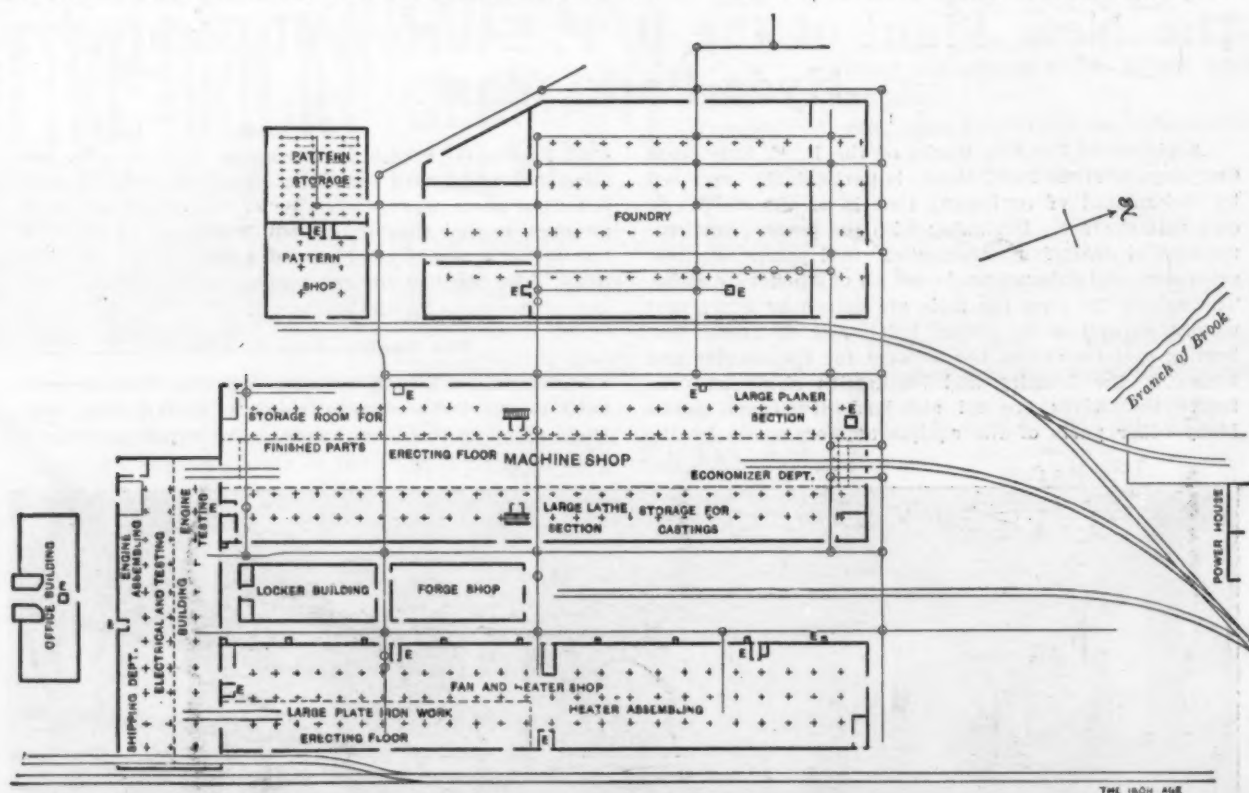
Plan of the Works, Showing the Spurs from the Railroad and the Industrial Railway System.
